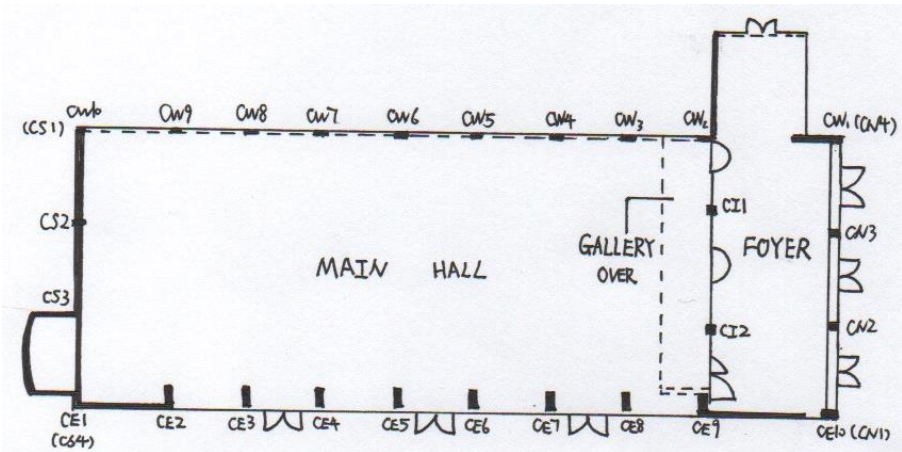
Plan View of Wilson Hall (Ground Floor)
